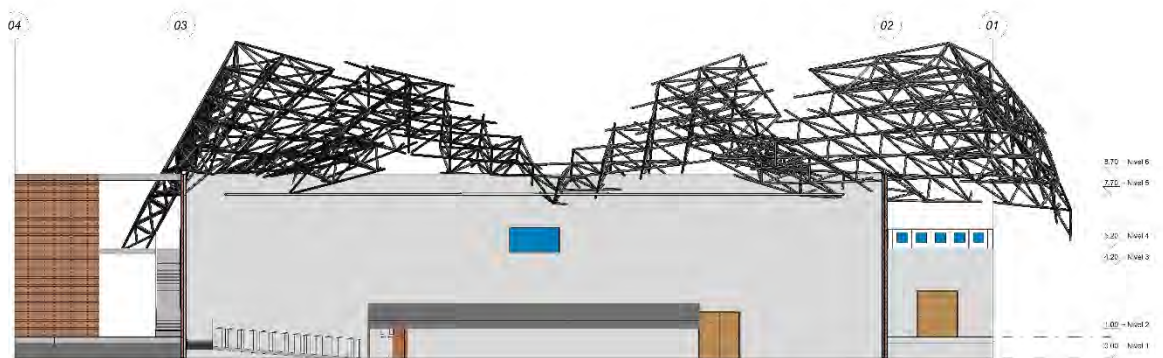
Section 02, south-north direction, shaded view (own image from Revit).
